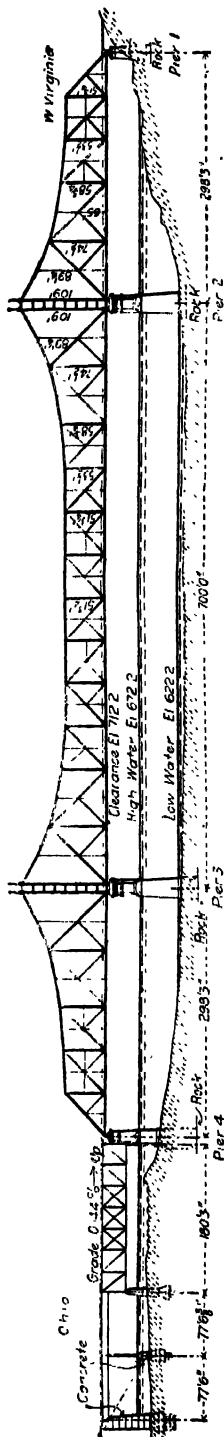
Wabash Railroad Bridge over the Ohio River at Mingo Junction, Ohio.
